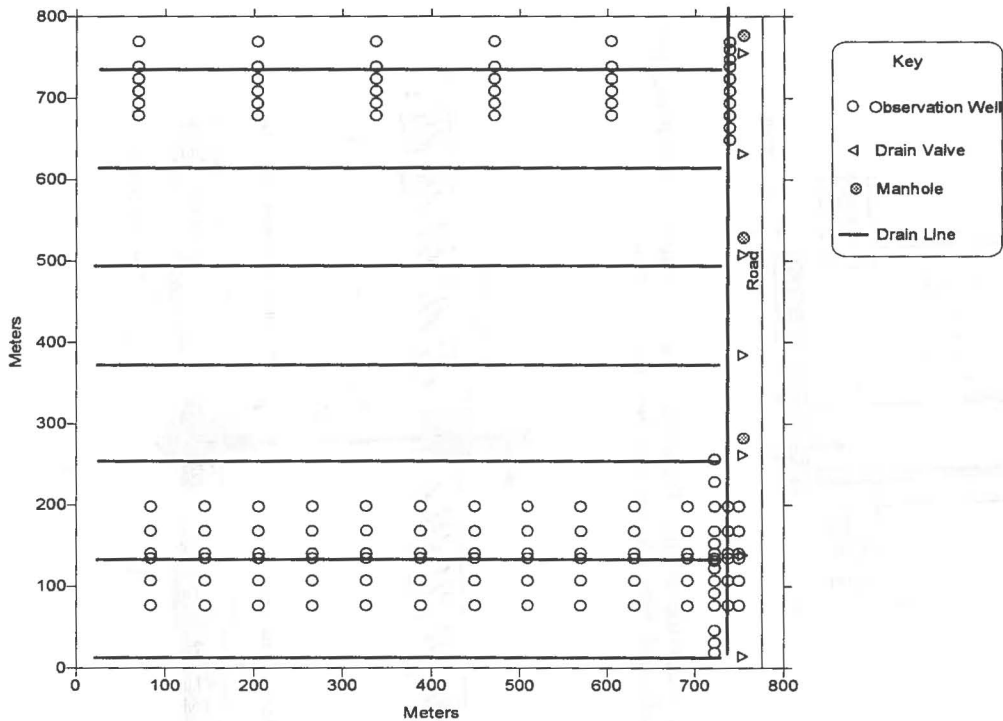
Layout of Broadview Shallow Ground Water Management Demonstration Project showing the locations of the subsurface drainage laterals, drain control valves, manhole, and observation wells.
